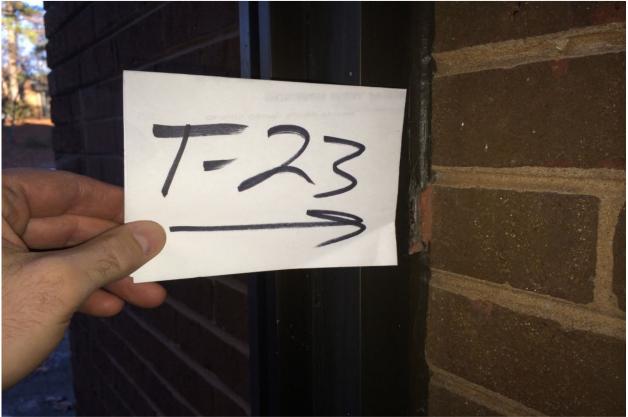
Laboratory analyses did not detect asbestos minerals within the window caulk sample TS-23 collected from the Theatre Building windows.
